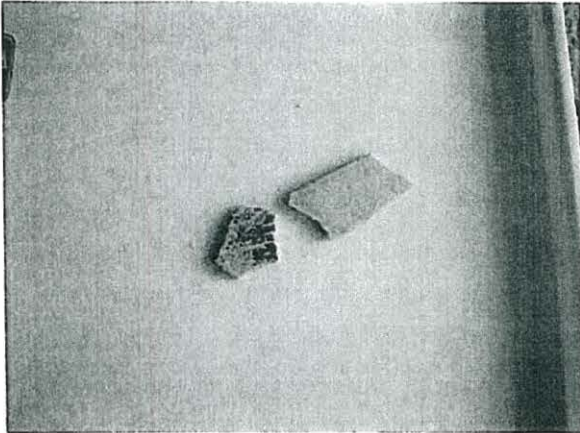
Photo of asbestos containing Floor Tile – Beige and Black Mastic, Samples 11A, 11B, 11C and 20A.
